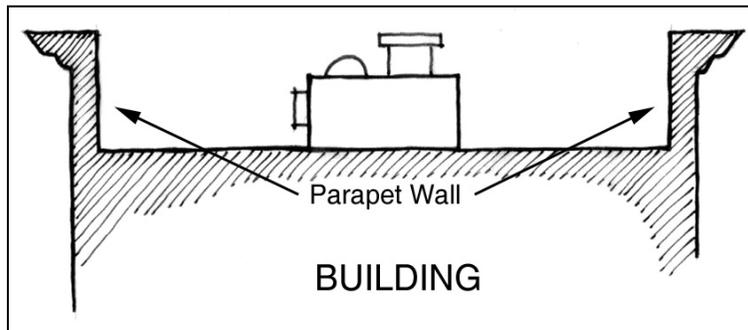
F: Example of how parapet walls are utilized to screen roof mounted mechanical equipment.
